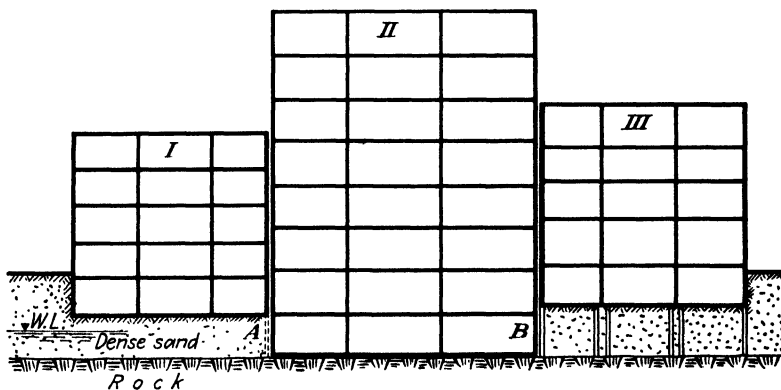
Wall A of building I has to be underpinned when building II is constructed; building III, when built later, has to be carried on piles of a type producing a minimum of soil displacement, or on caissons.
